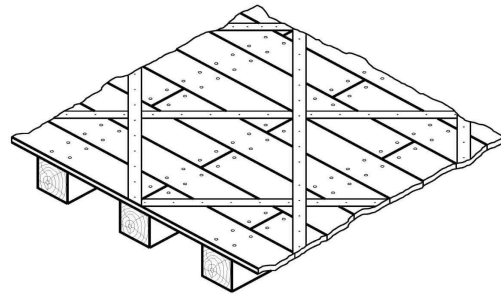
Diagonal bracing of the existing wood planks by means of light steel plates or FRP laminae
